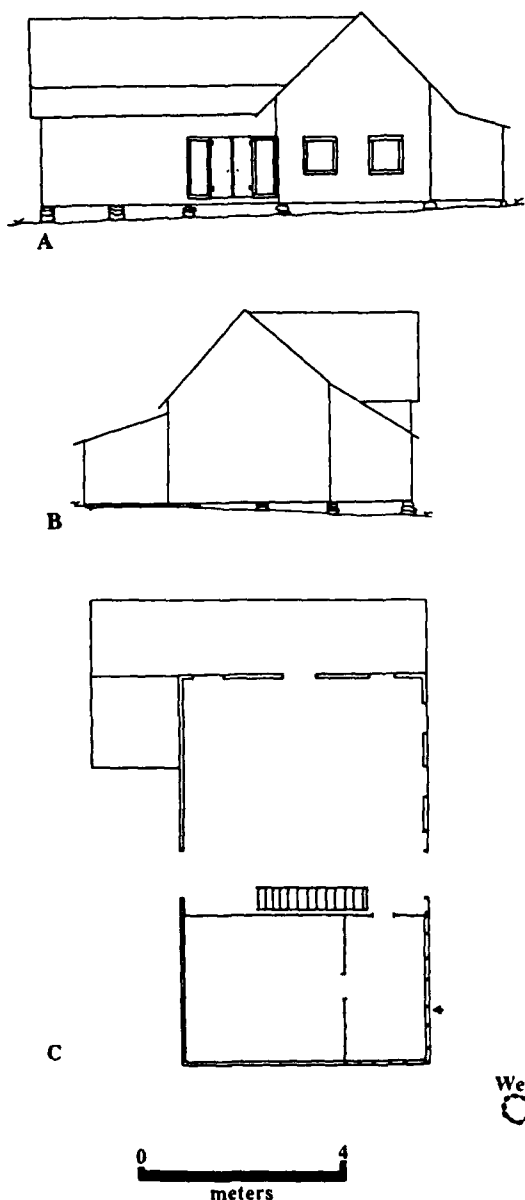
The (a) north (b) south elevations and the floor plan (c) of the Lowe dwelling, reconstructed from the remaining ruins. The structure was a ca. 1880 central hall with a T-floor plan, and was constructed of sawn pine lumber with cut nails and mortise and tenon joinery. Note that the northeast room had red cedar posts set into the ground. This was an original part of the two story construction.
